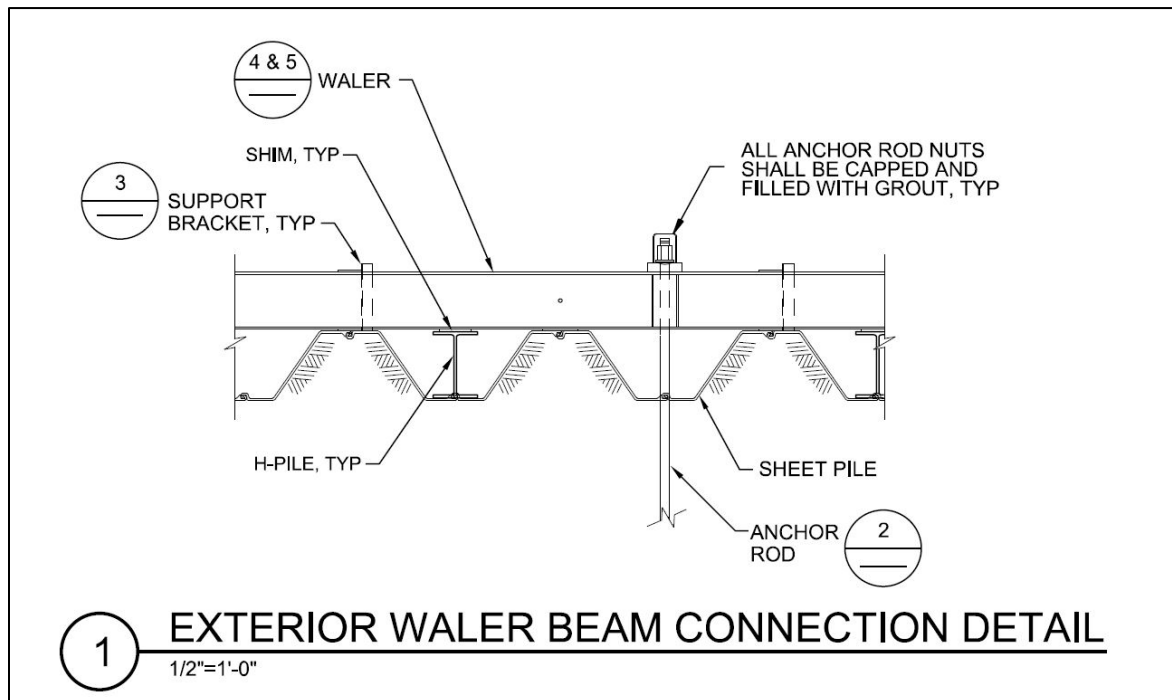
Exterior Waler Beam Connection Detail from the 2012 Sheet Pile Stability Design Documents
